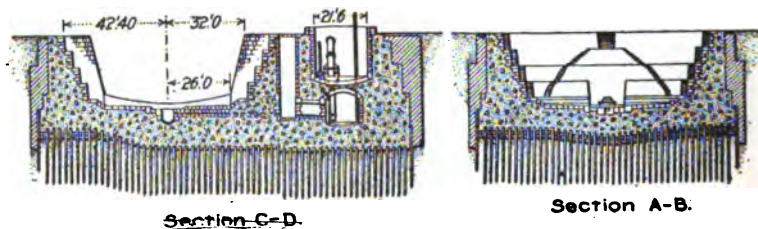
KOBE DRY DOCK CROSS-SECTIONS.
